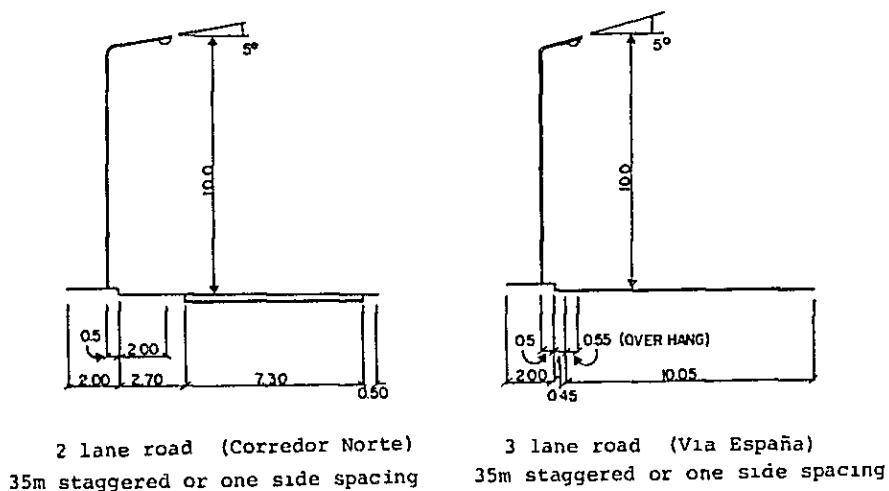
TYPICAL LIGHTING INSTALLATION
